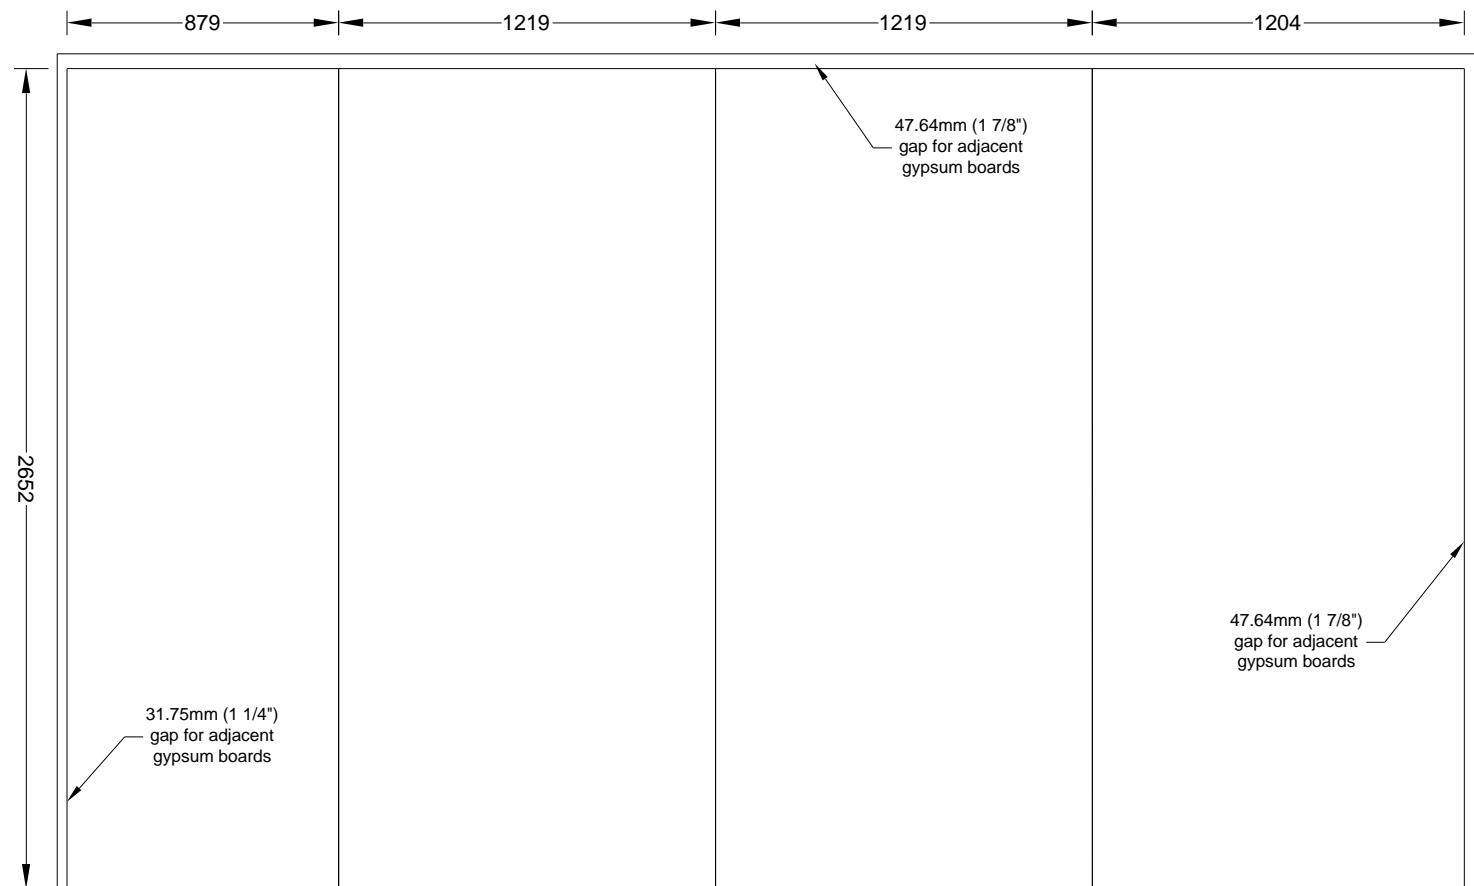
Test 1-2 Large Compartment CLT - W3 - Gypsum Layout - Face Layer
